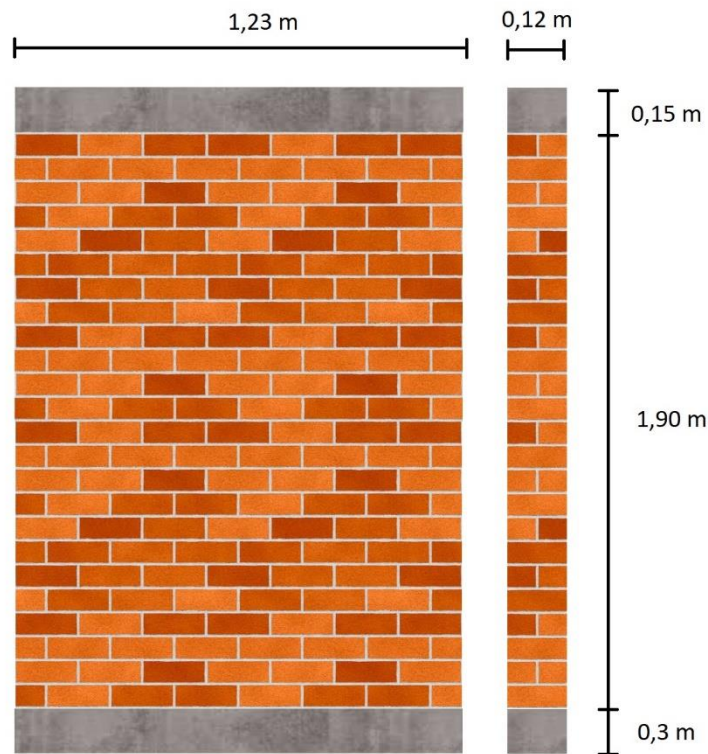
Dimensions of masonry walls from test made by Vega Vargas (2015) (Figure by authors)
